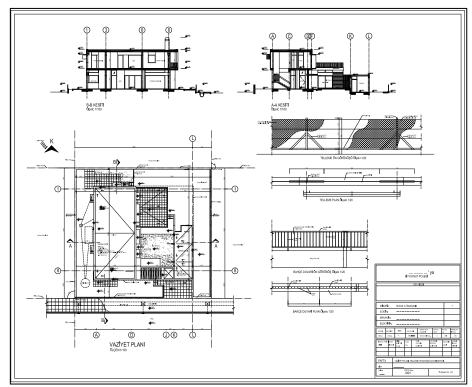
Example Site plan for Turkish Cypriot Chamber of Architects (Mimarlar Odası, 2017)
